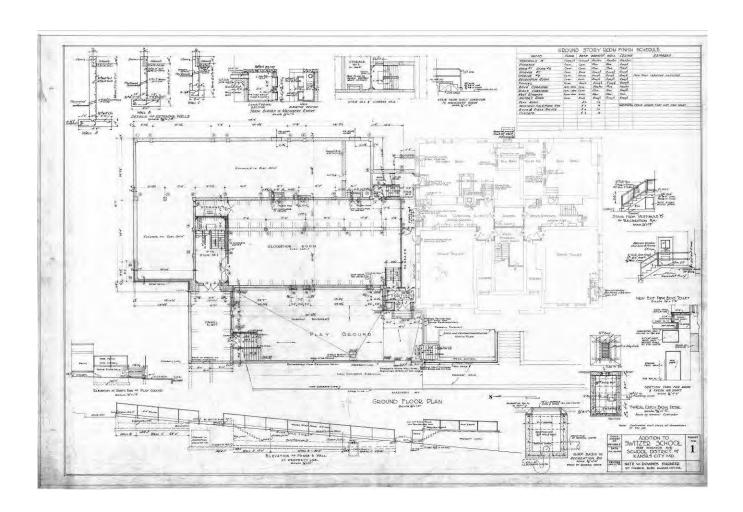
Addition to Switzer (South) 1939: First Floor Plan PWA No. MO 1584 F
